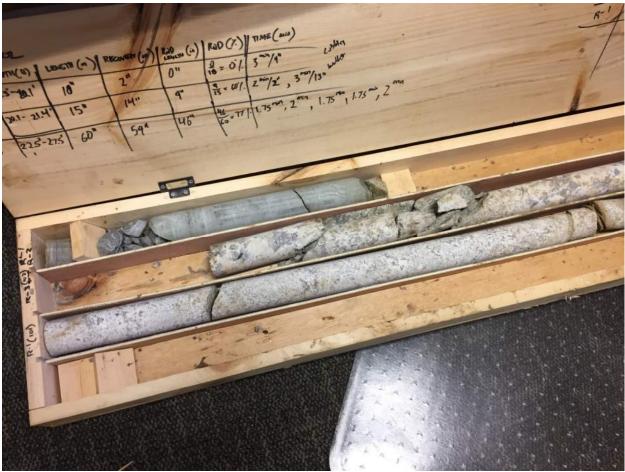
Boring BB-WHB-102: Rock Core Samples R-1 and R-2 (Row 1), R-3 (Row 2); Boring BB-WHB-101: Rock Core Sample R-1 (Row 3). Picture shows first 2.5 feet of each row.
